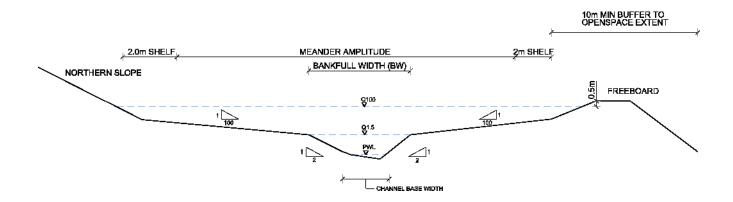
Typical section of the northern realignment in terms of flooding profiles
